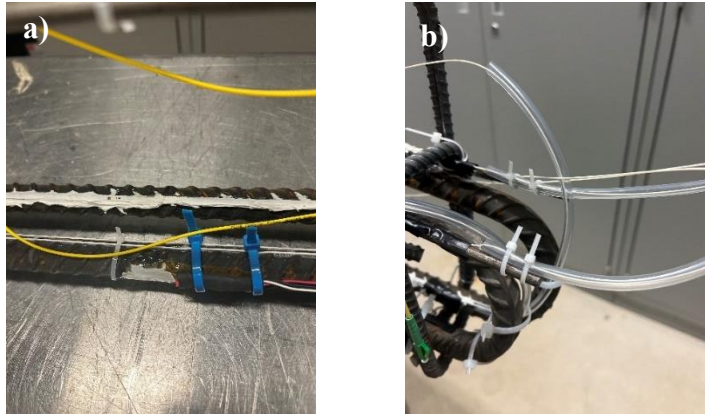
a) DFOS on Rebar and b) Protection of DFOS at Exit Point
